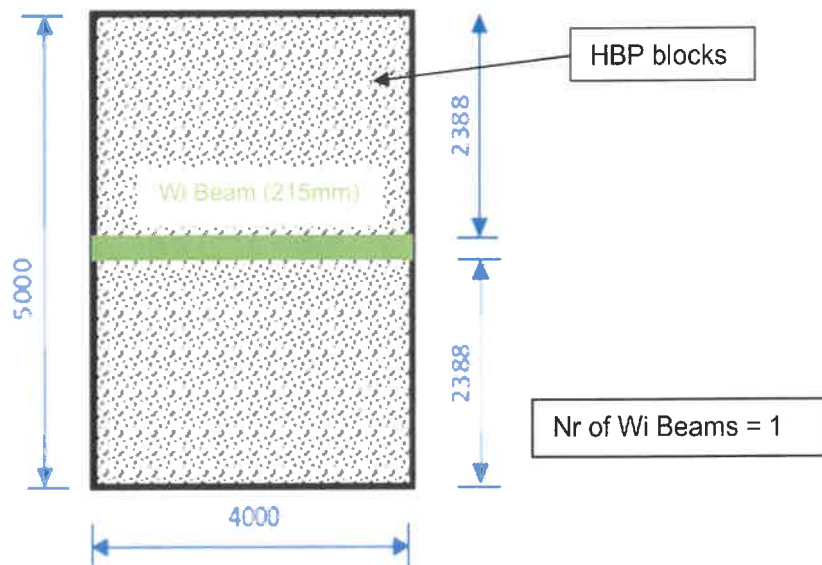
Type 1 wall panel designed with Wi Columns and HBP blocks
